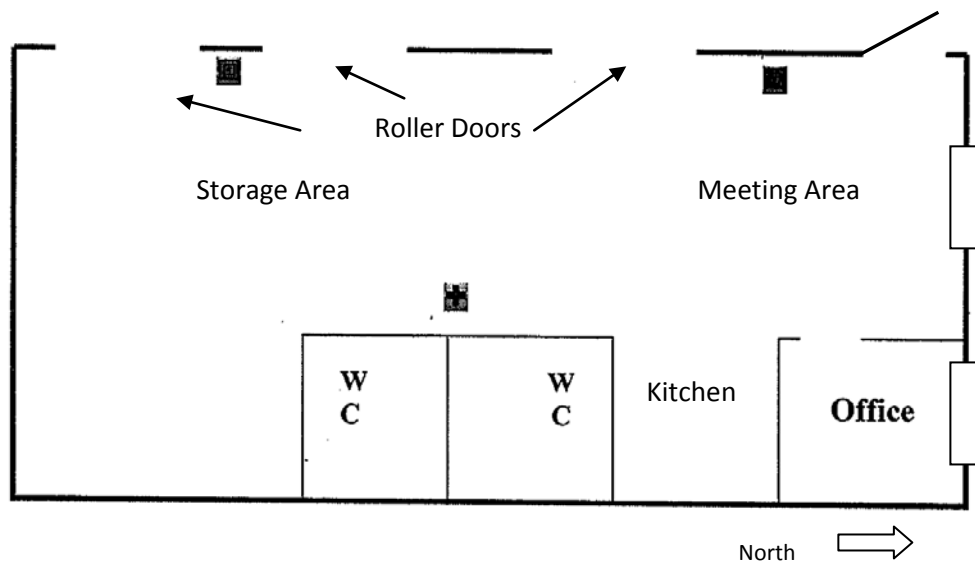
Basic Floor Plan of Warwick SES Building. Courtesy SDRC.
